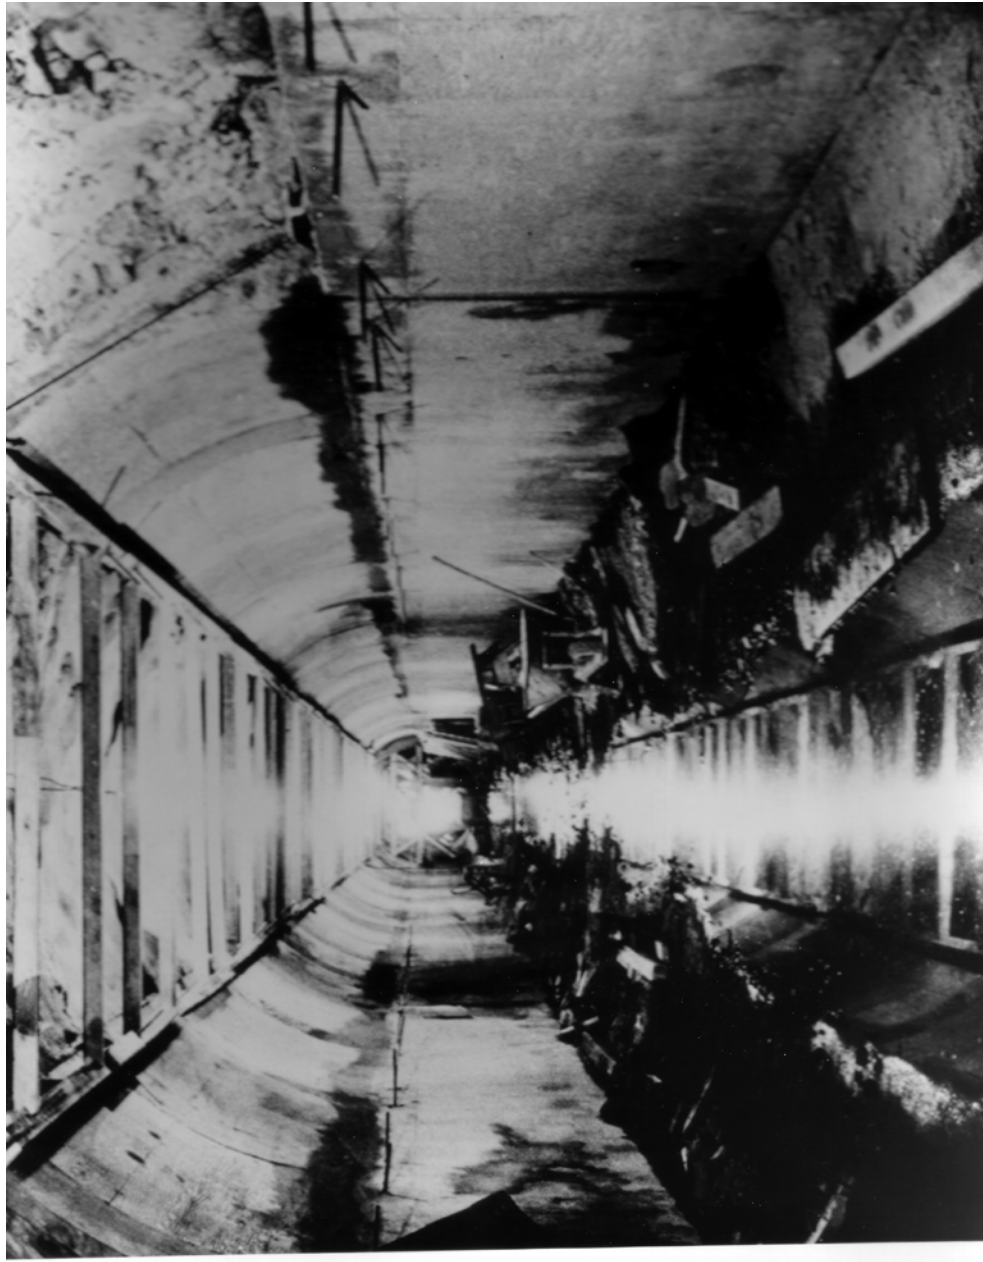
INTERIOR OF TUNNEL LOOKING SOUTH. CONCRETED LINING COMPLETED ON INVERT AND WALLS, ARCH PARTIALLY COMPLETED. 11 March 1944.
